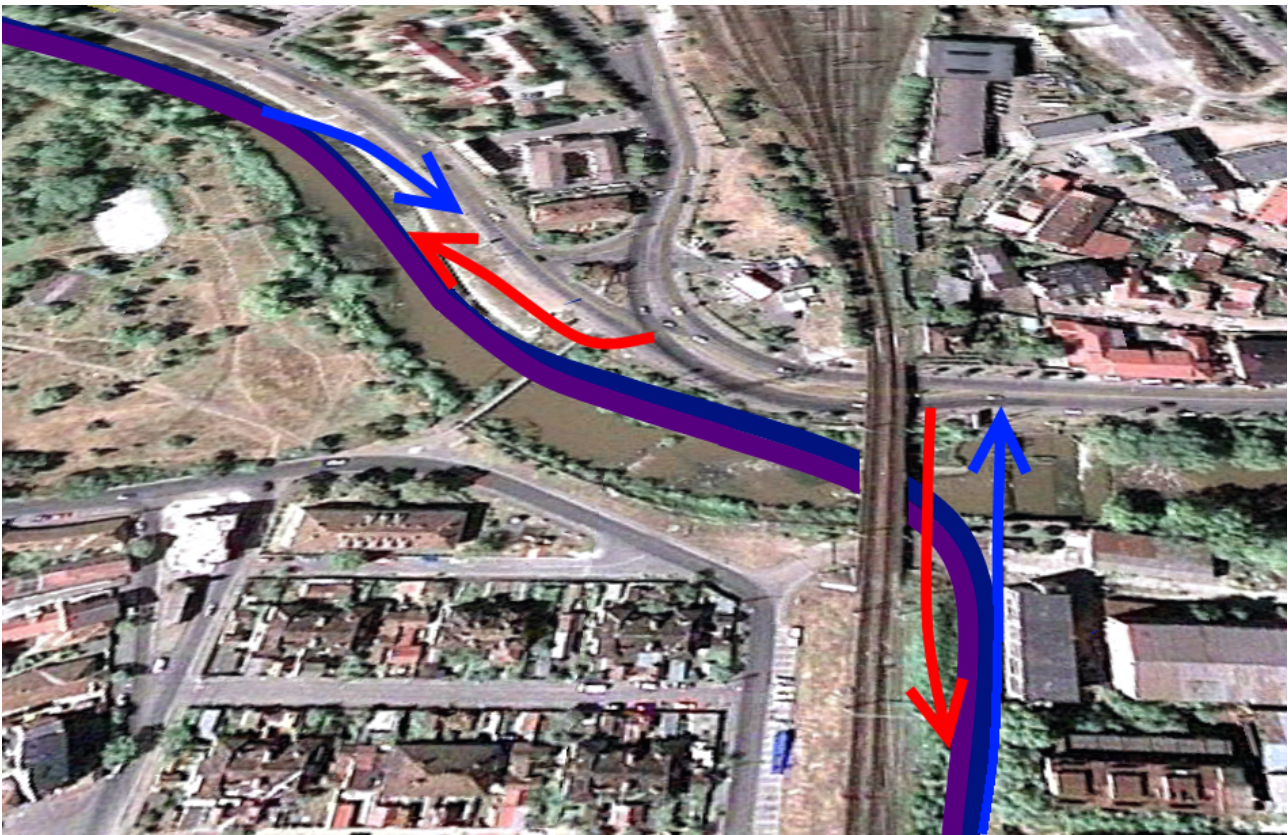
Proposed layout of IC 7 and of the underground – overground transition of AUCN 2
